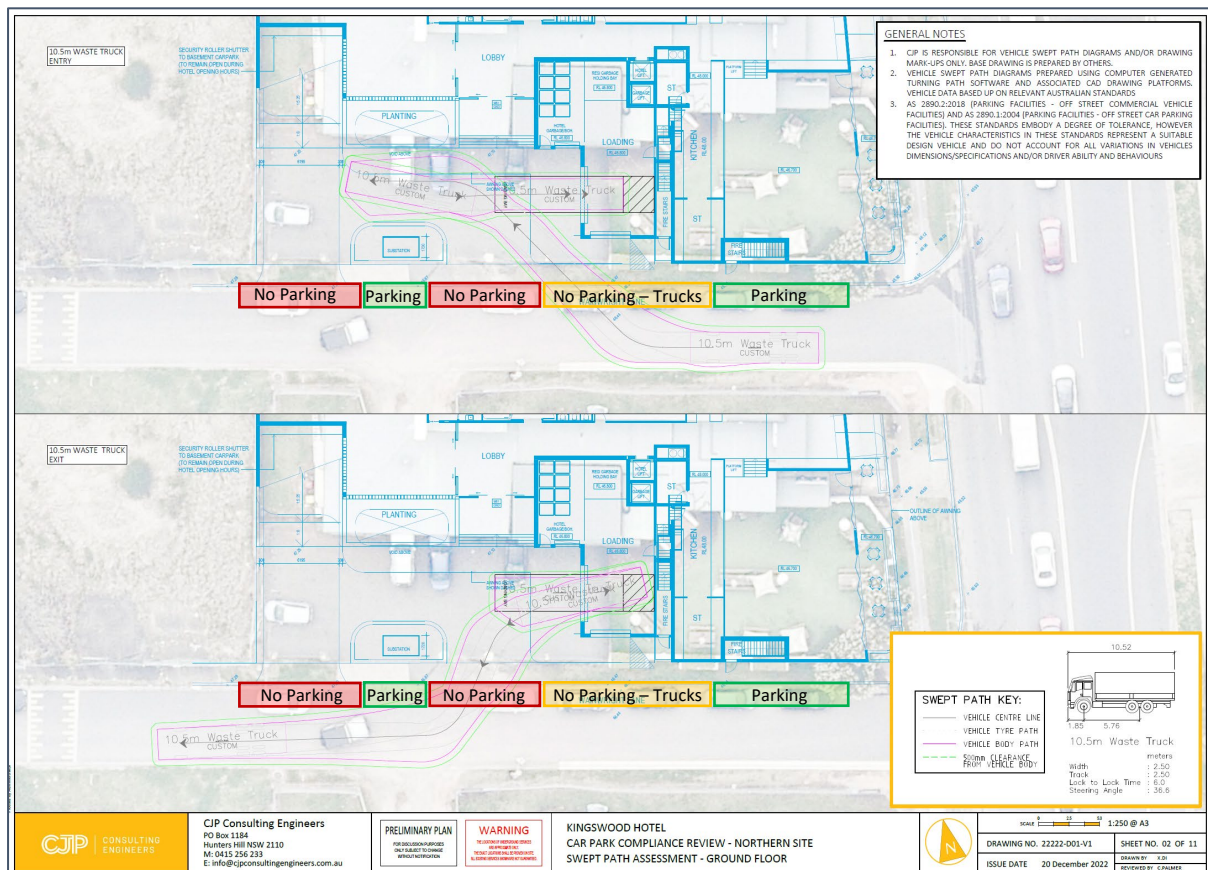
Option 2: On-street loading with required on-street parking restrictions in Wainwright Lane
